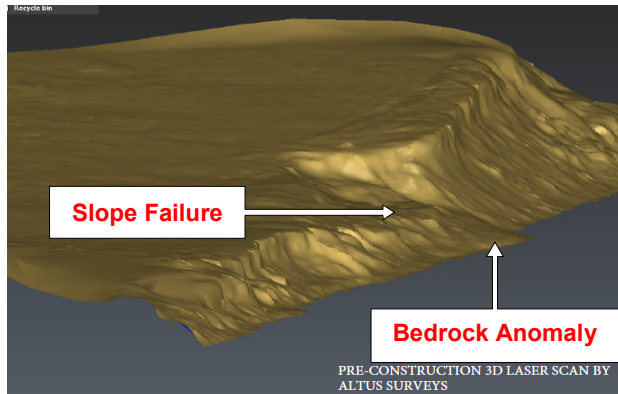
Pre-construction 3D laser scan showing site conditions and riverbank slope failure before remediation
